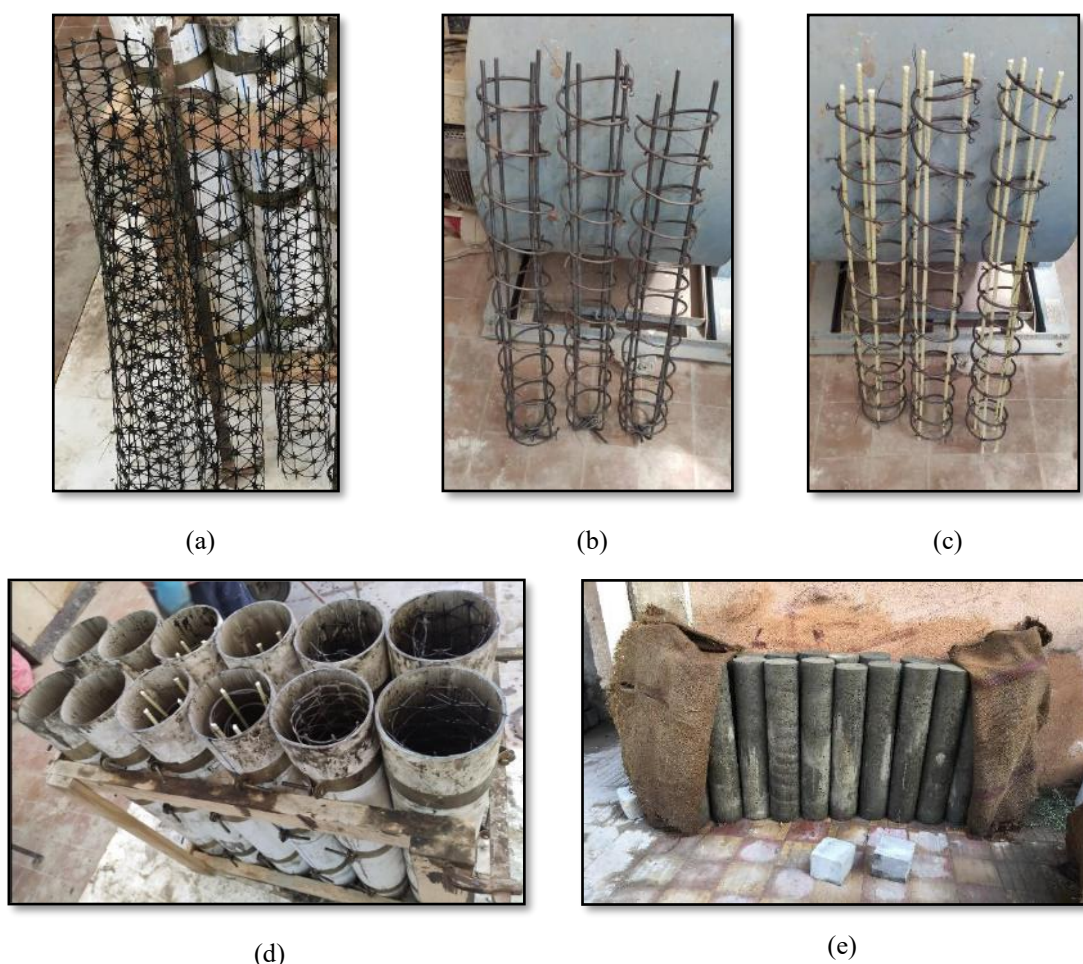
Fabrication of the tested specimens: (a) PGG specimens, (b) Ps specimen, (c) PGGB specimens, (d) completed formwork of the specimens and (e) specimen's curing.
